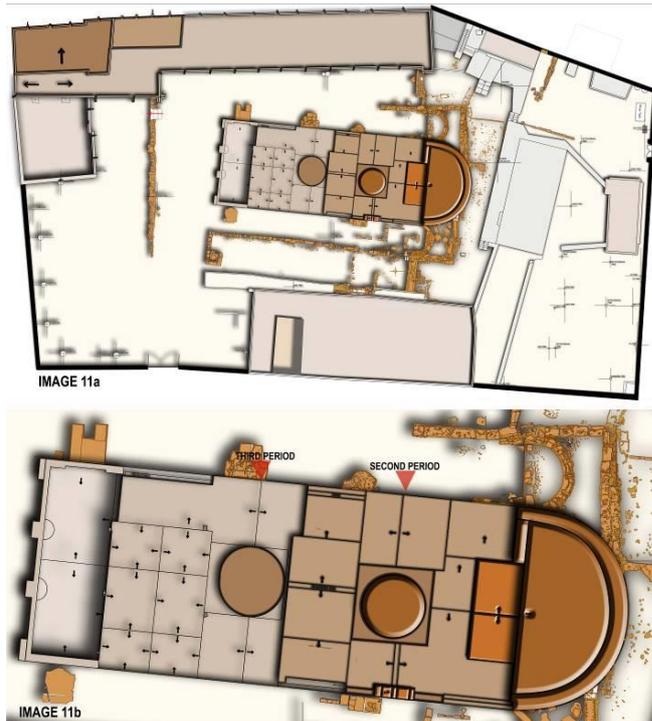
(a) Survey drawing of the site, roof plan (b) survey drawing of the church building, roof plan
